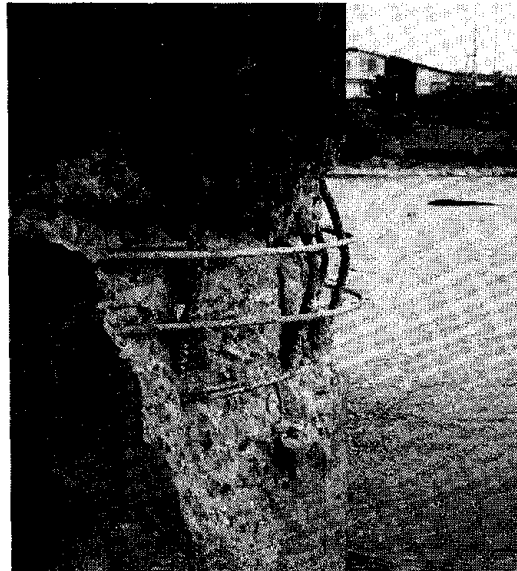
Damage of Pier P3 at Motoe Bridge
